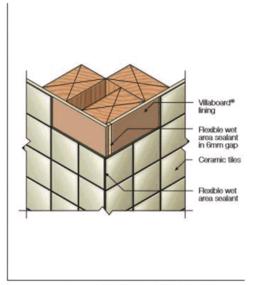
EXTERNAL TILED CORNER - NON SHOWER AREA NOTES
